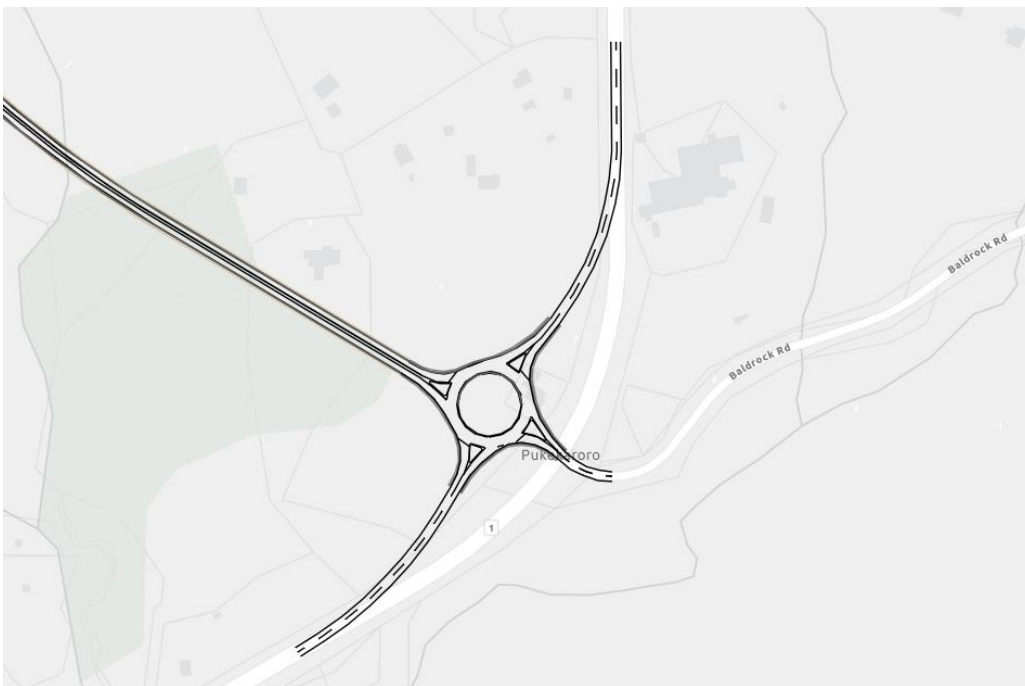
Baldrock Road roundabout - Project Scenario (source: Northland Corridor – Section 2B Planning Hub)
